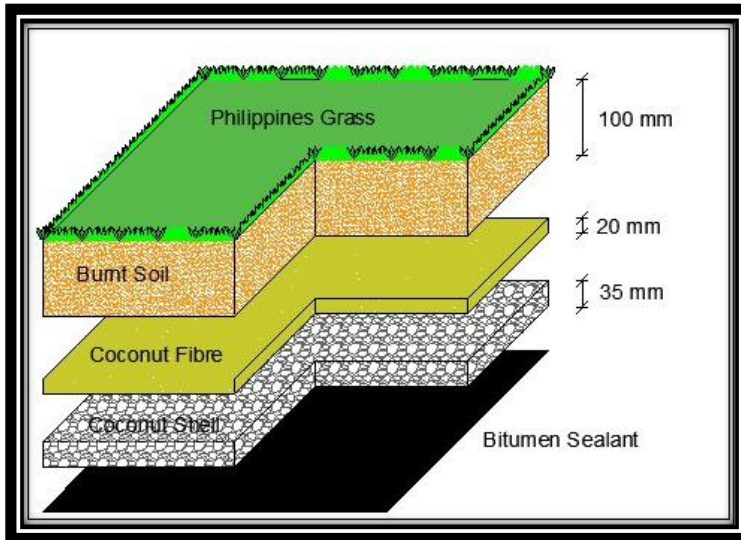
Layers Dimension of Recycled Waste Green Roof
